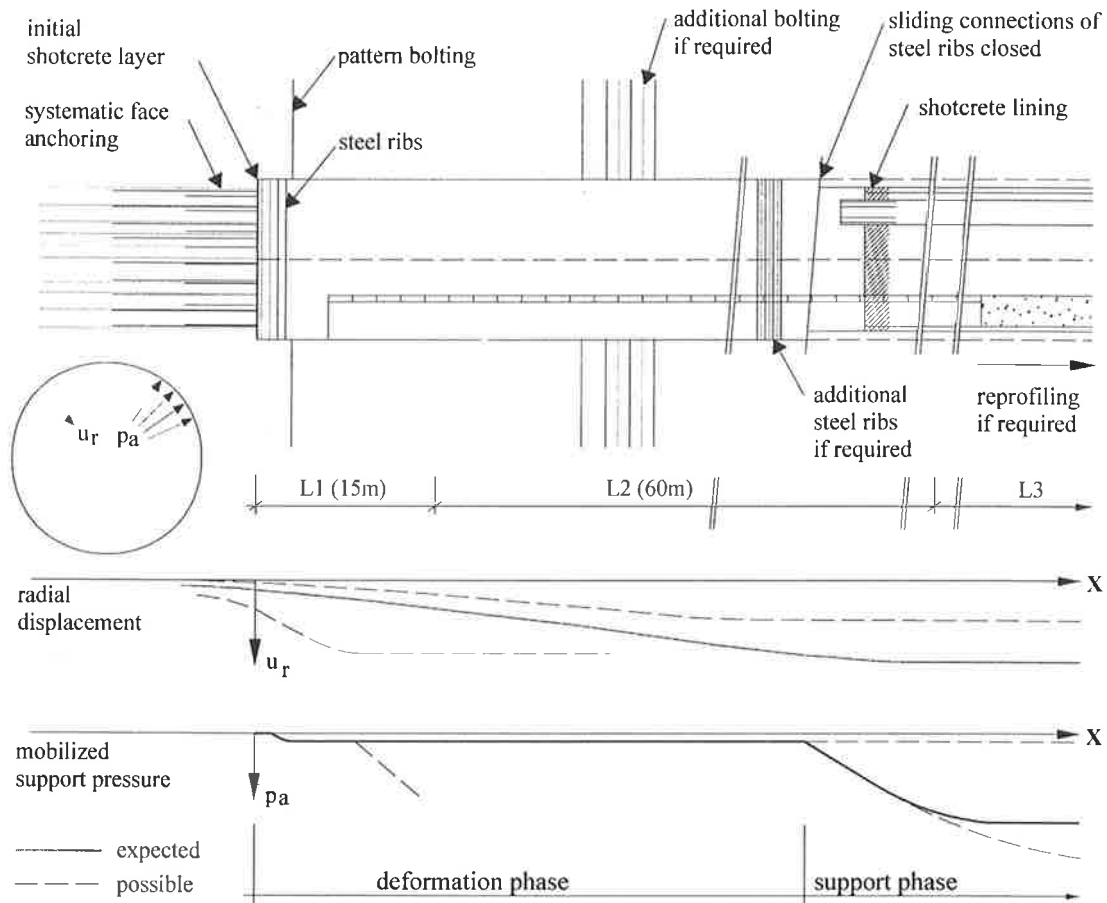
Design concept for Sedrun North Tunnel (deformations and support pressure)
